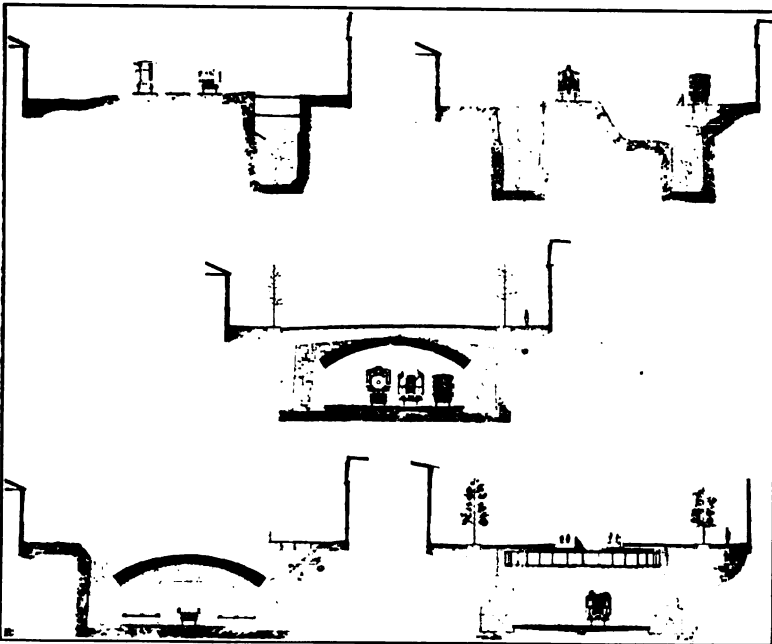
TYPICAL TUNNEL PROGRESS.
